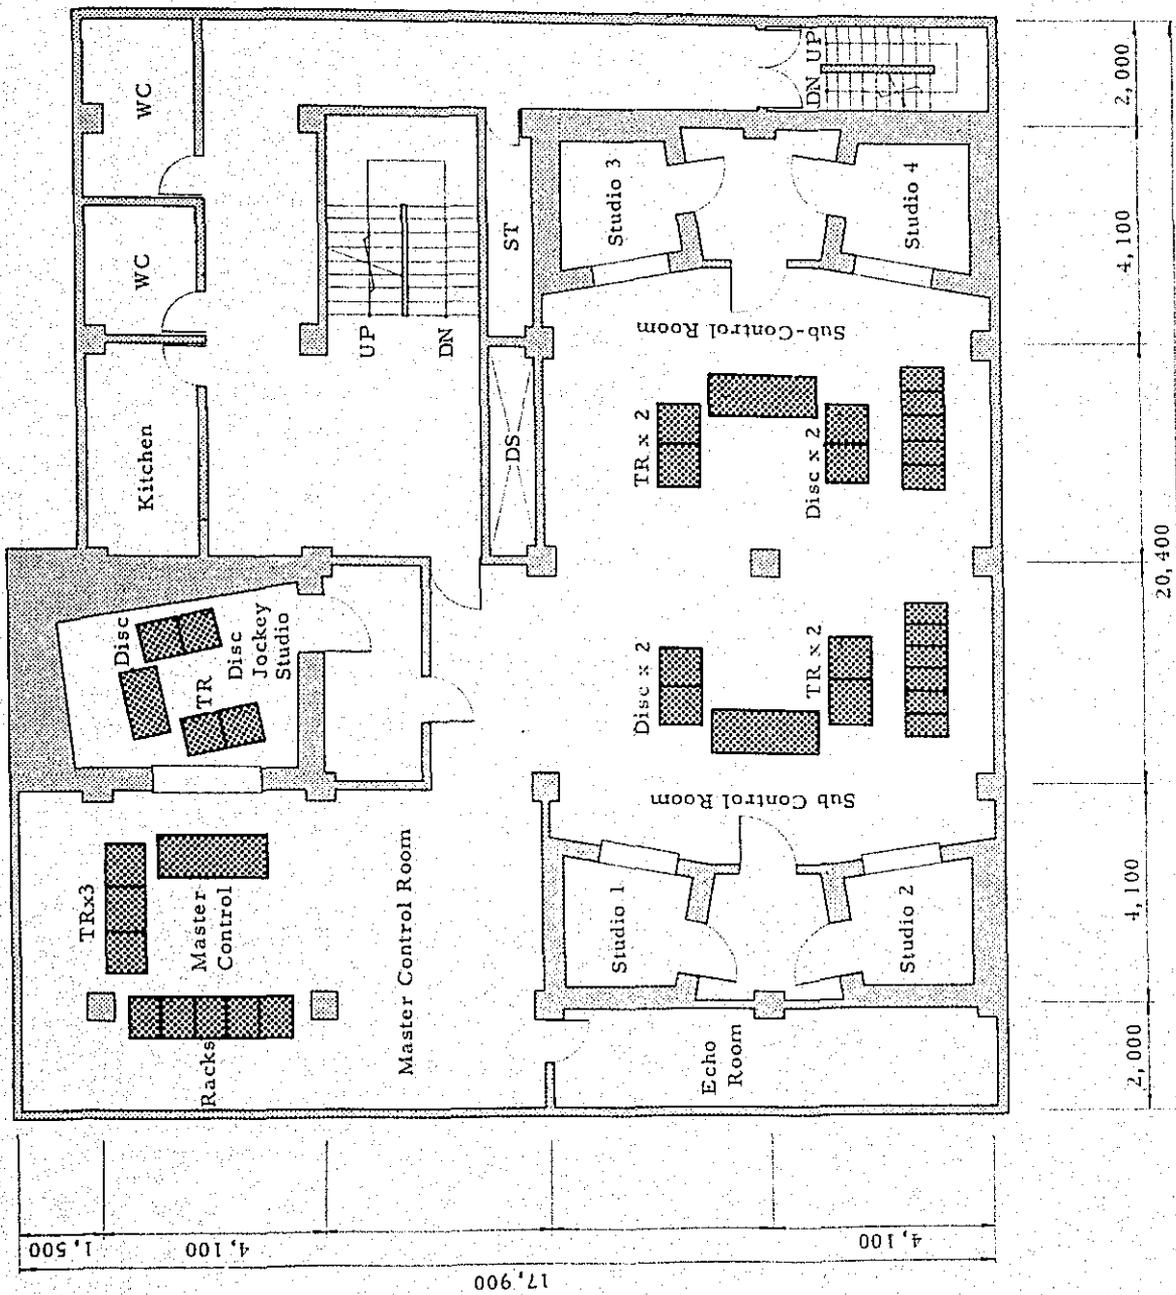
Lay out PLAN of New Radio Studio Building - 3F PLAN
